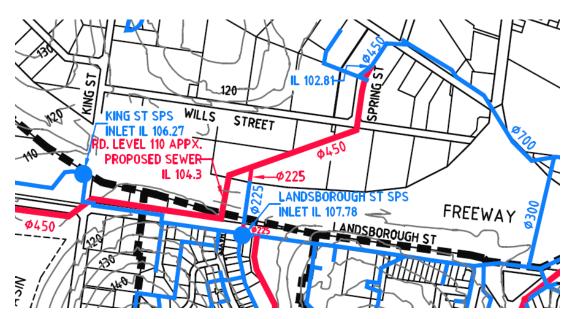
Warragul South Sewer Strategy – Existing and proposed trunk sewers (Gippsland Water)
